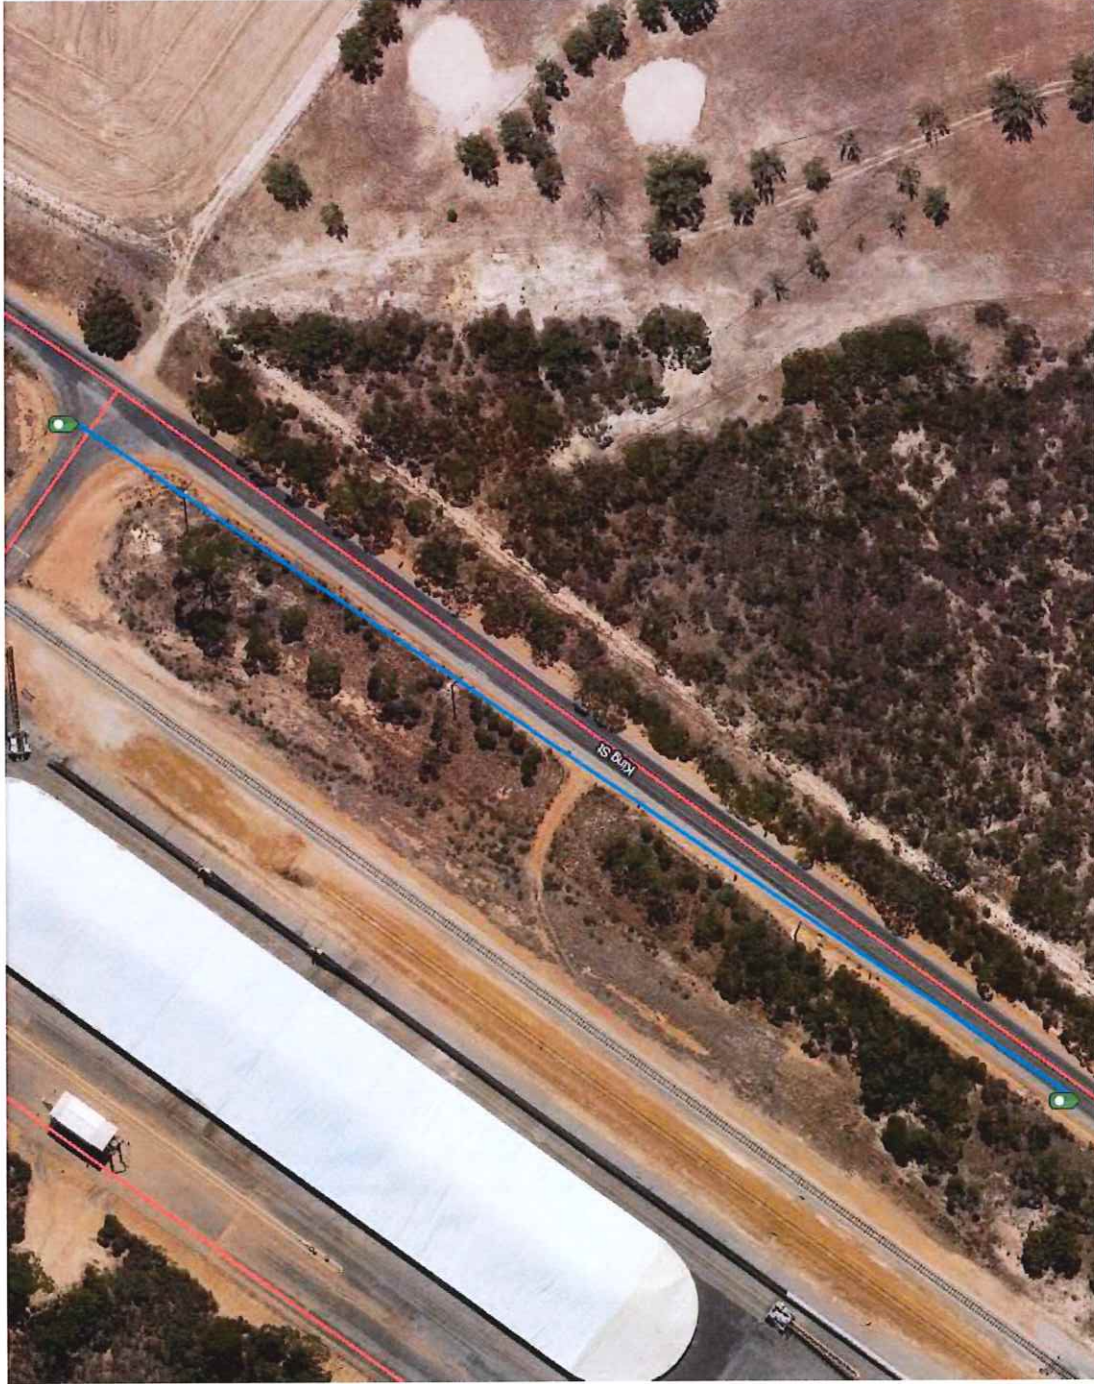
Site Exit at Cochrane Rd & King St intersection – Required Line of Sight: 256 metres south
